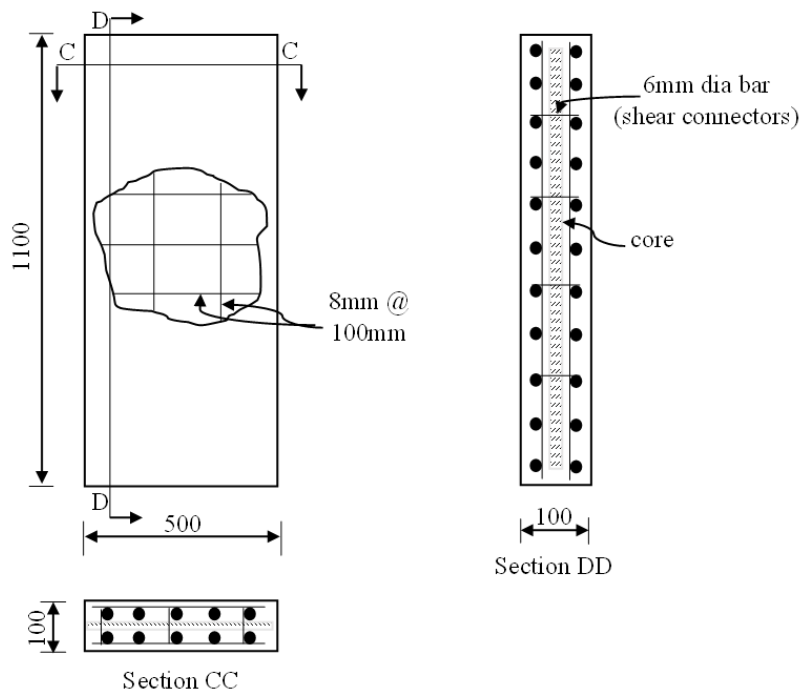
Geometric details of precast concrete sandwich panels (All dimensions are in mm)
